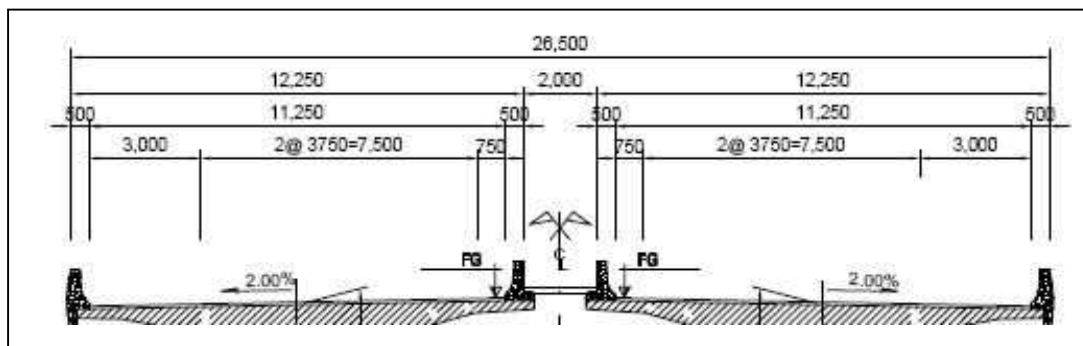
Cross Section of Bridges on Ring Road No. 3
